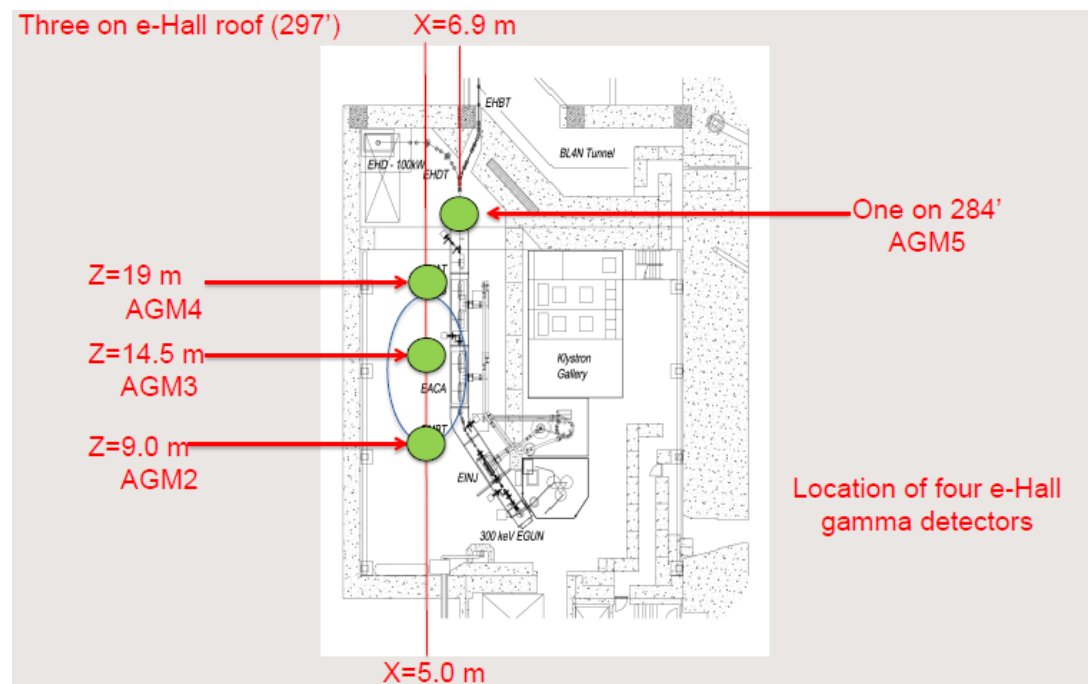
Schematic showing the location of e-Hall gamma monitors. These are located on the roof at elevation 297' and one is on the lower elevation roof (284') at the north end of the e-Hall. [N.b. The gap in the south wall is where the 4-foot thick shielding door is located.]
